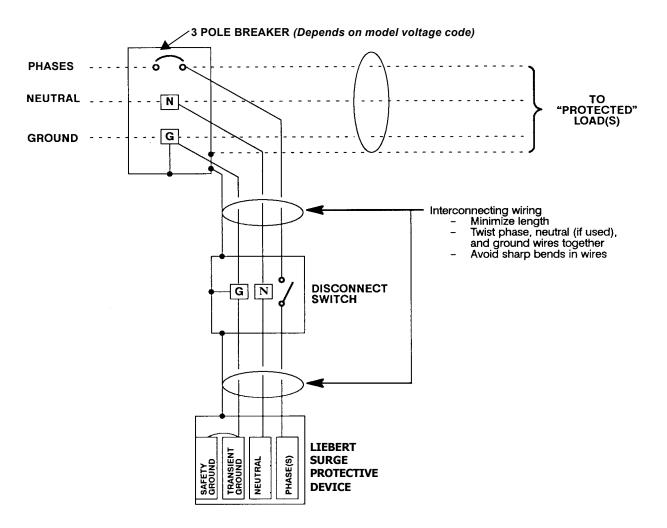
Typical Parallel Connections (with External Disconnect Switch)
